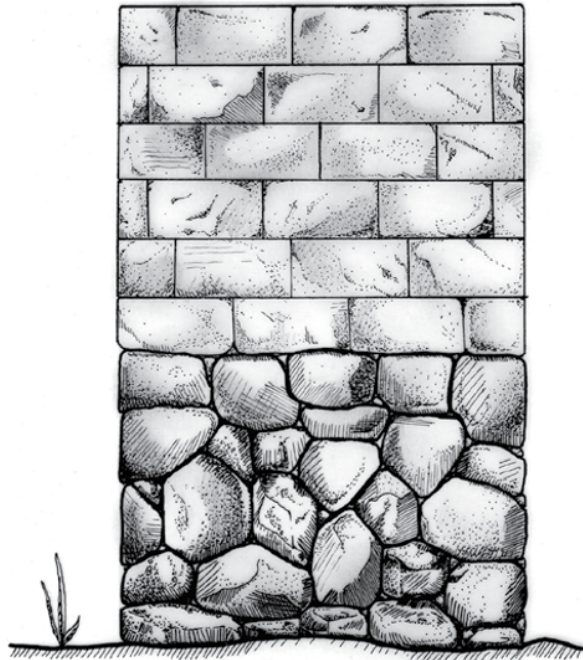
Section of double face wall, elevation of wall with stone socle and mudbrick upper. *Source:* S. Huisbrink, used with permission.
